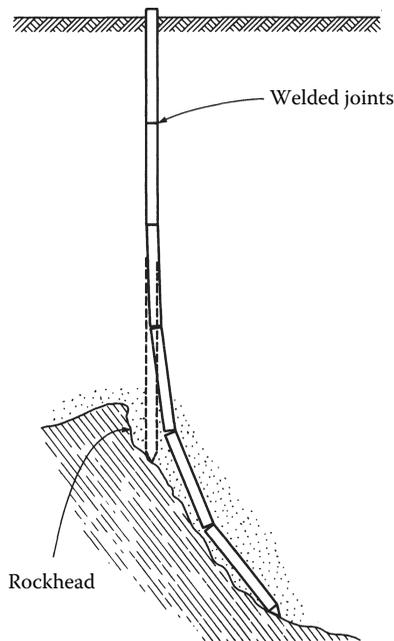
Unseen breakage of precast concrete piles with welded butt joints.
